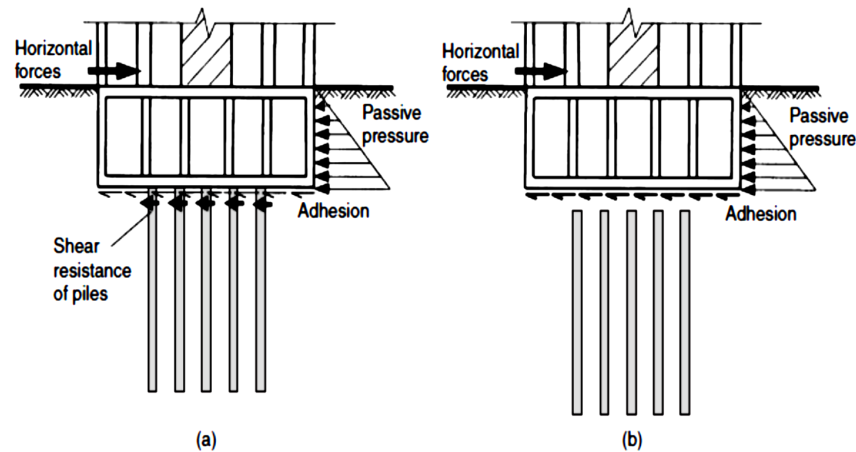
Transfer mechanism for horizontal loads: a) piles structurally connected to raft and b) piles structurally unconnected from raft [11].
